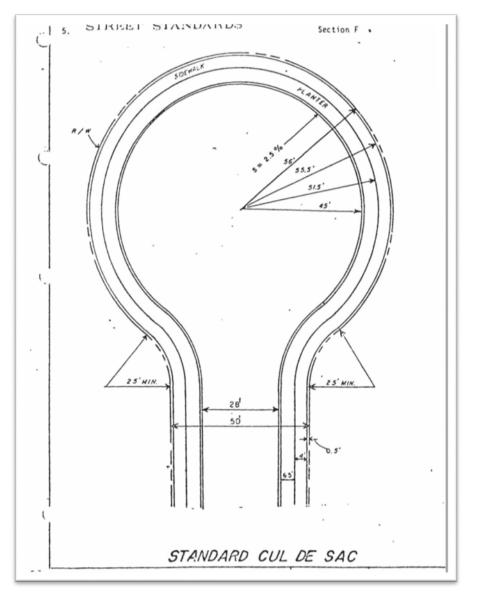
Independence Comprehensive Plan Cul-de-sac Street Cross Section
